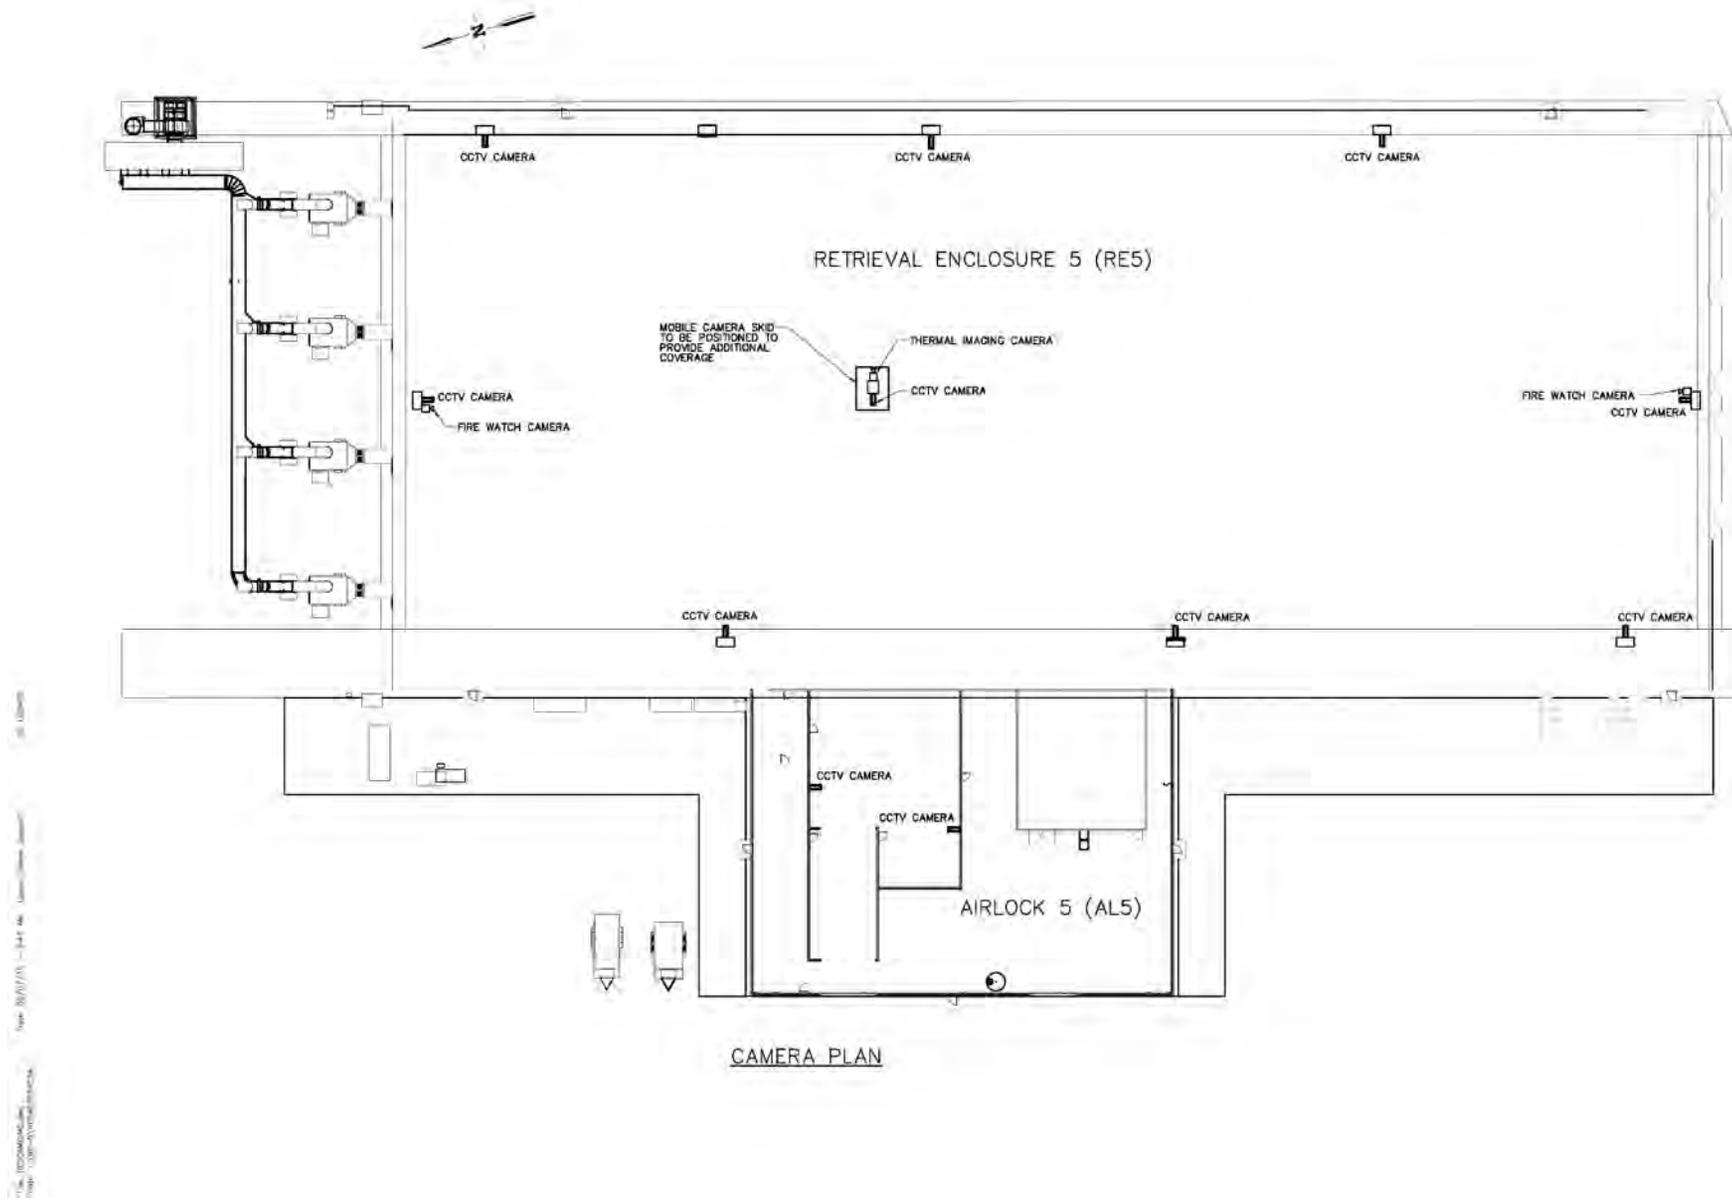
WMF-1617 Retrieval Enclosure Camera Plan
